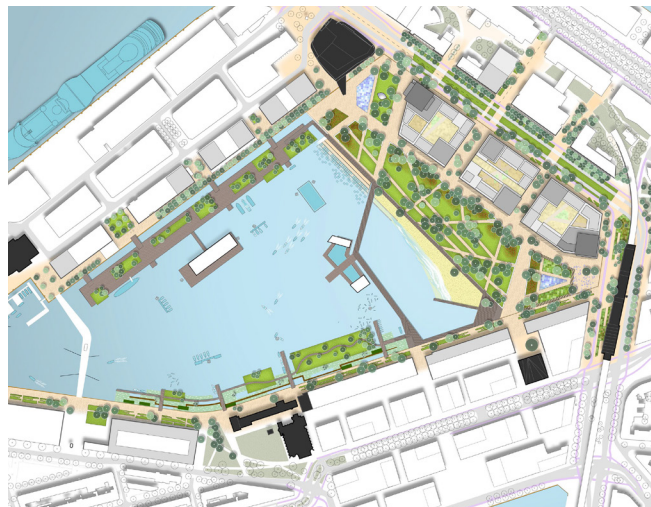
Plan area Rijnhaven (Team Rijnhaven, 2020)
